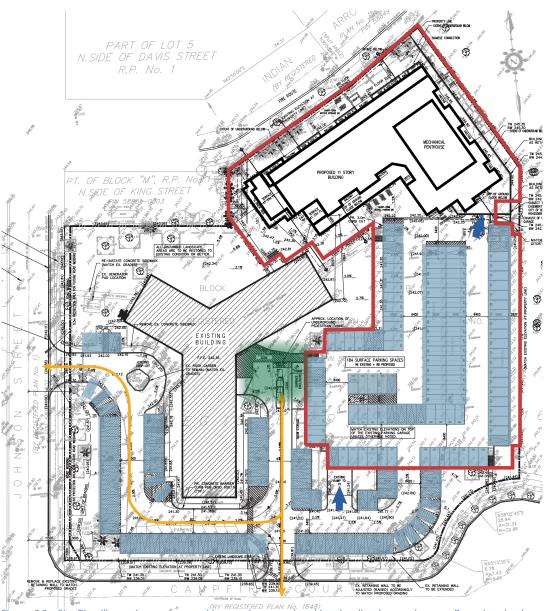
P1 Plan, illustrating parking spaces, vehicular circulation and pedestrian access. Base plan by architectureunfolded
